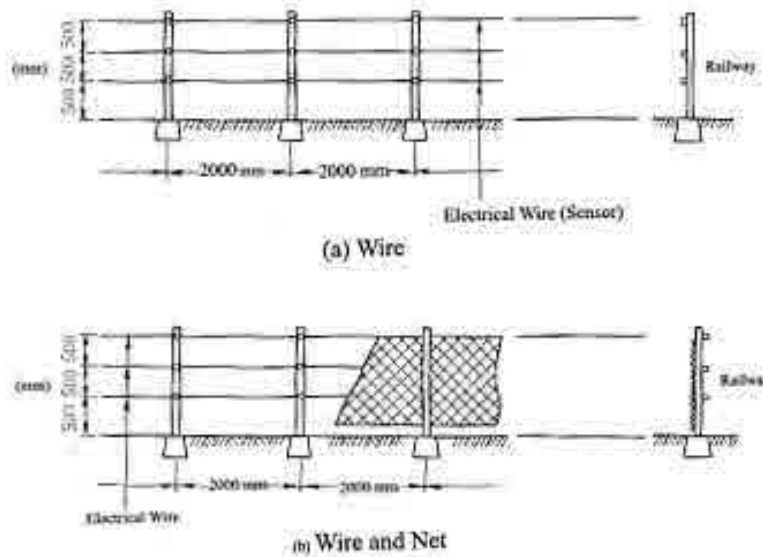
Example of Rock Fall Detector (Japan Railway)
